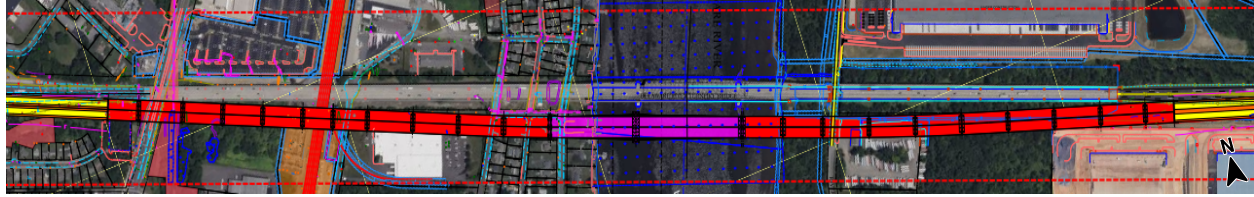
Alternative SPI: South Partial Impact to existing approach spans
